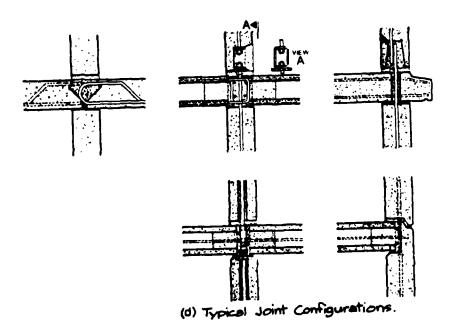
Horizontal Panel-to-Panel Joints (Ref. 19).
